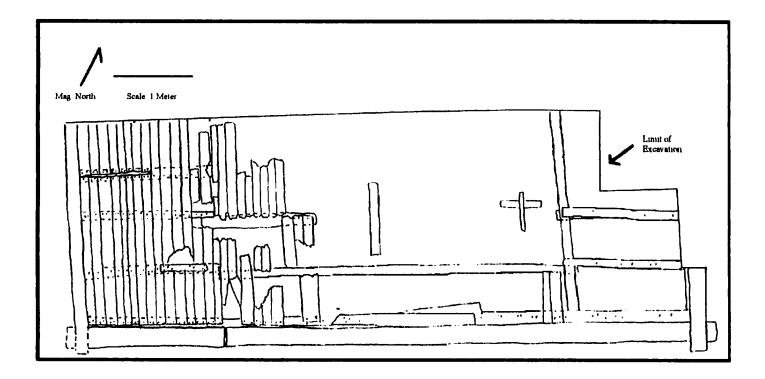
Wiseman Feature 1, excavated foundation's remaining structural elements.
